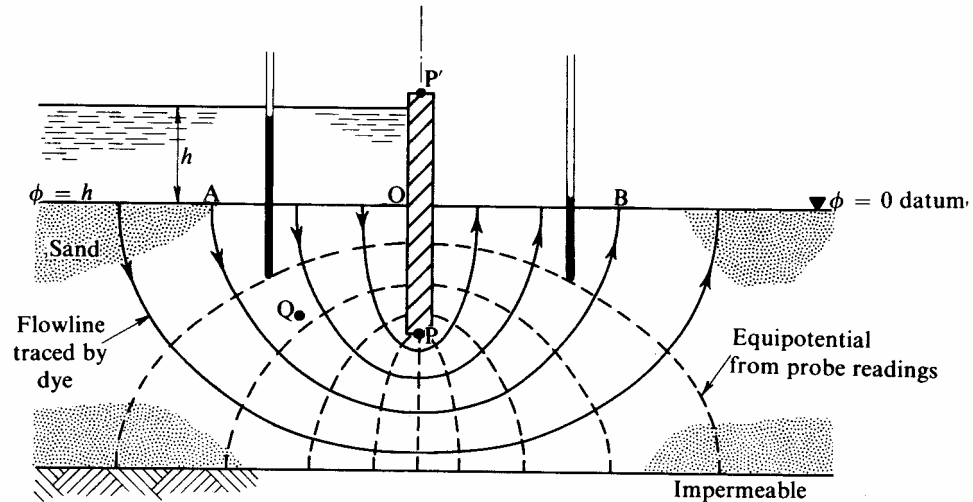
Seepage under Model of Long Sheet Pile Wall
